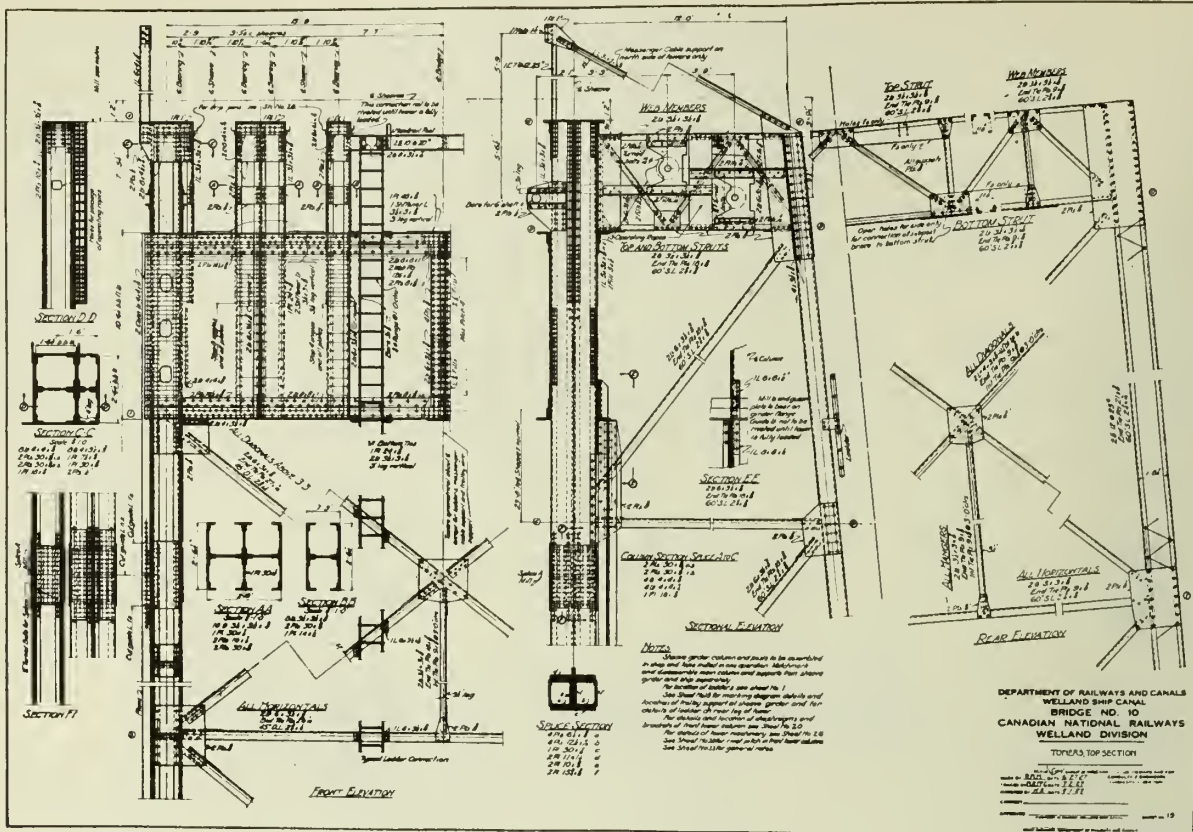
Bridge No. 10—Towers—Top Section.
